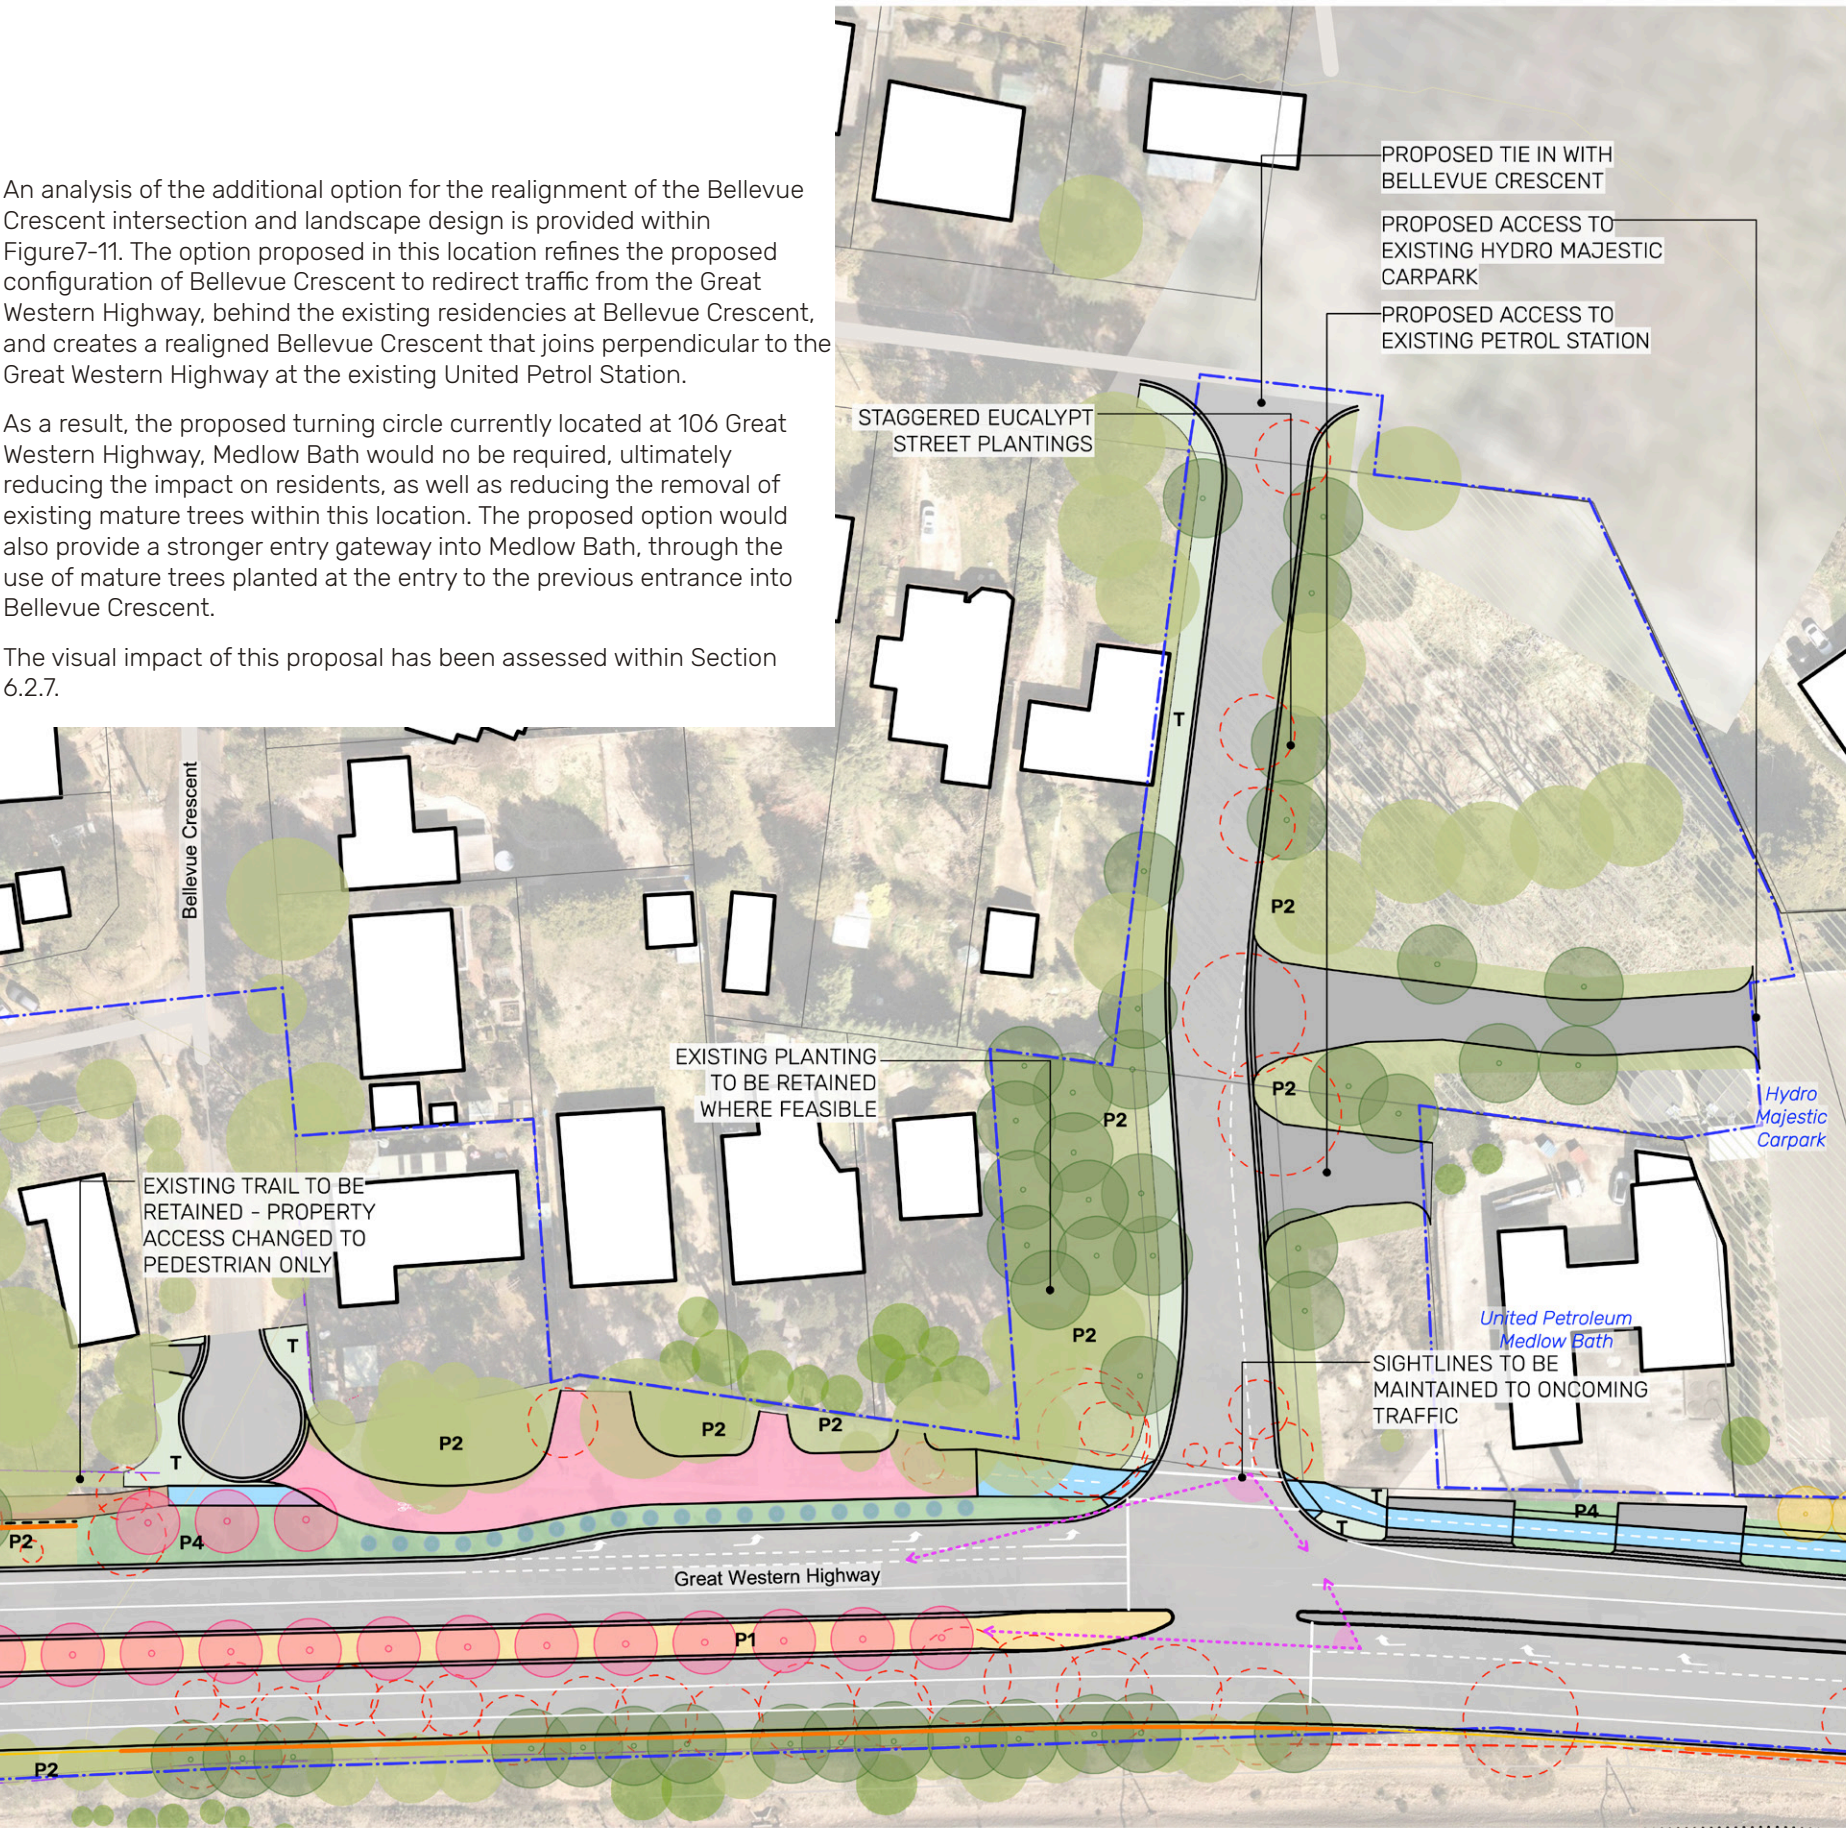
Option - Bellevue Crescent Realignment Detail Plan
